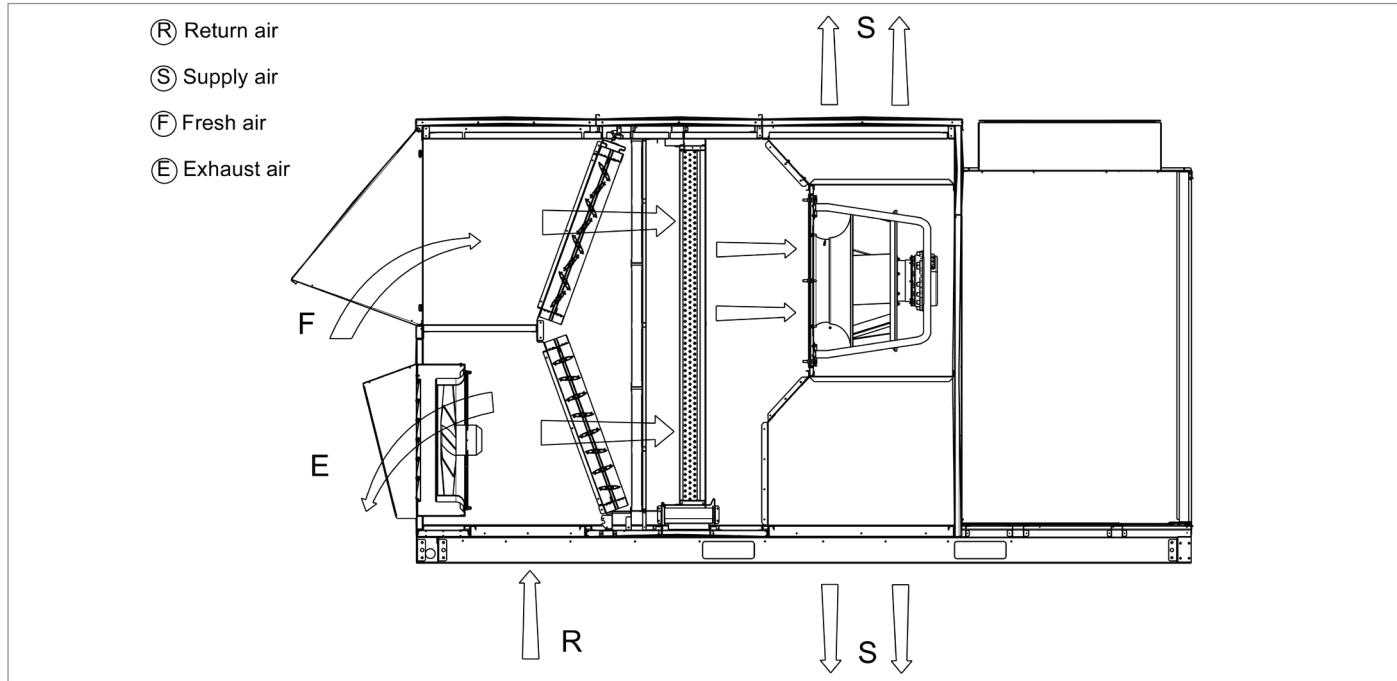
Power exhaust - Exhaust air outlet from bottom side
